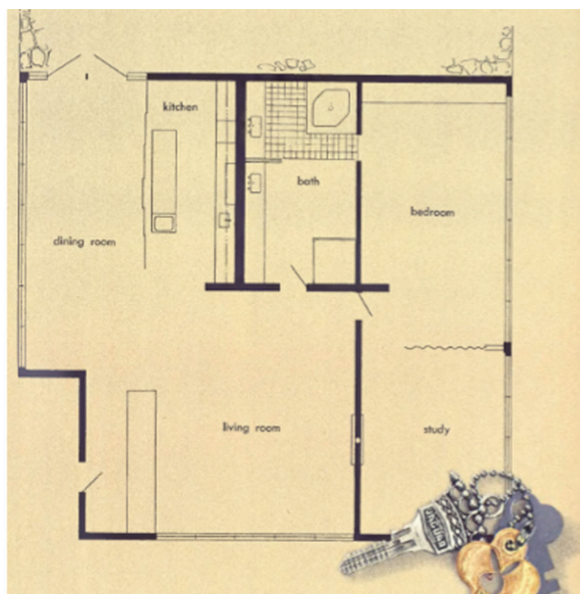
Floor plans for Playboy's Penthouse Apartment.
